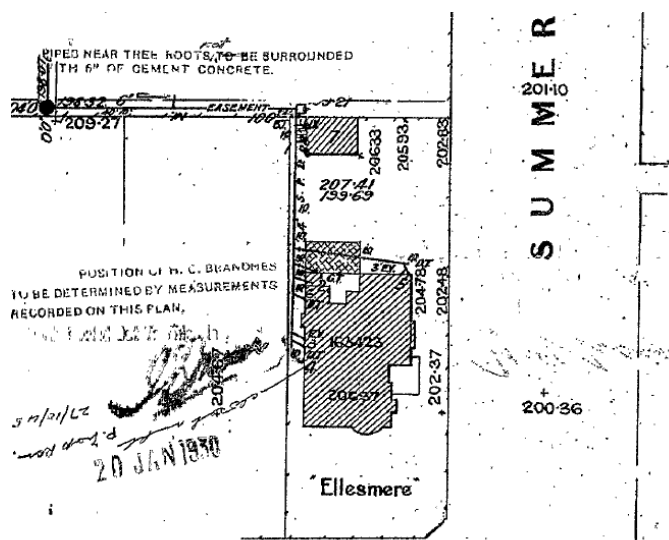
Property sewerage plan, showing the house at 152 Summerhill Road, 1930 (Source: Yarra Valley Water).
